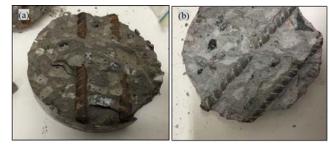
Reinforcement bar in (a) GPC, (b) OPC concrete
